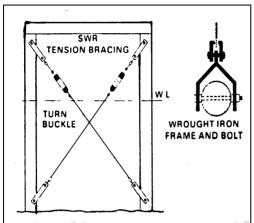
Diagonal Bracing for Pile Bents Below Water Level
